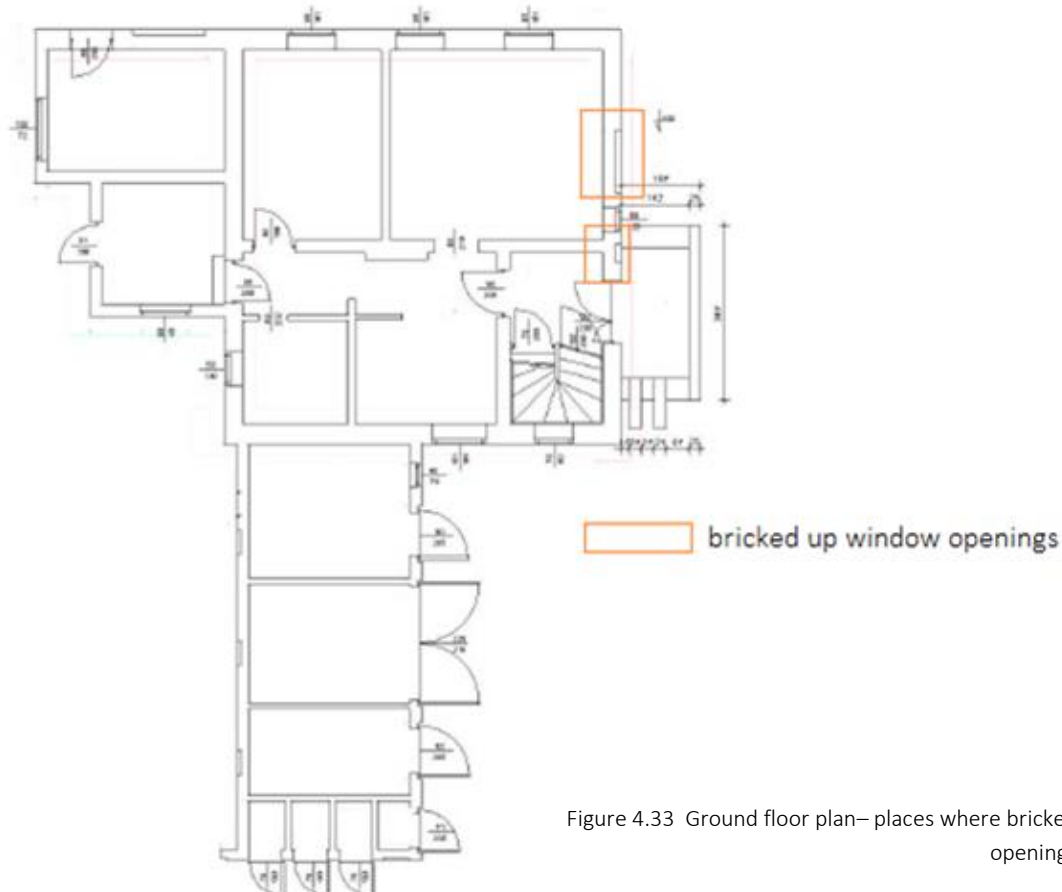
Ground floor plan– places where bricked up window openings are placed.
